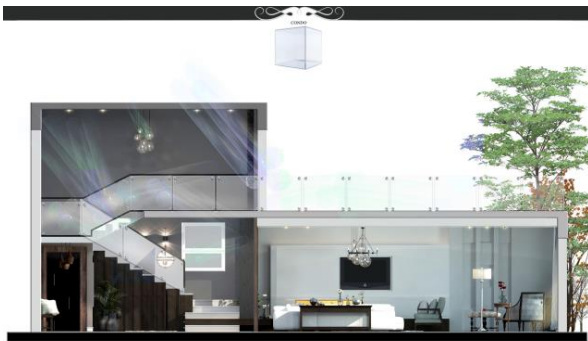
(Author, 2018): Section (A-A) of a condo design project.
